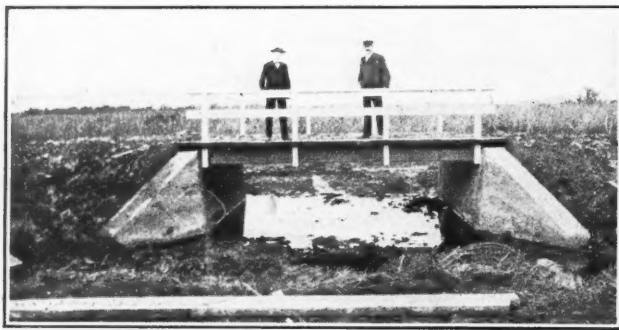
CULVERT WITH SUBSTANTIAL ABUTMENTS AND WING WALLS.
